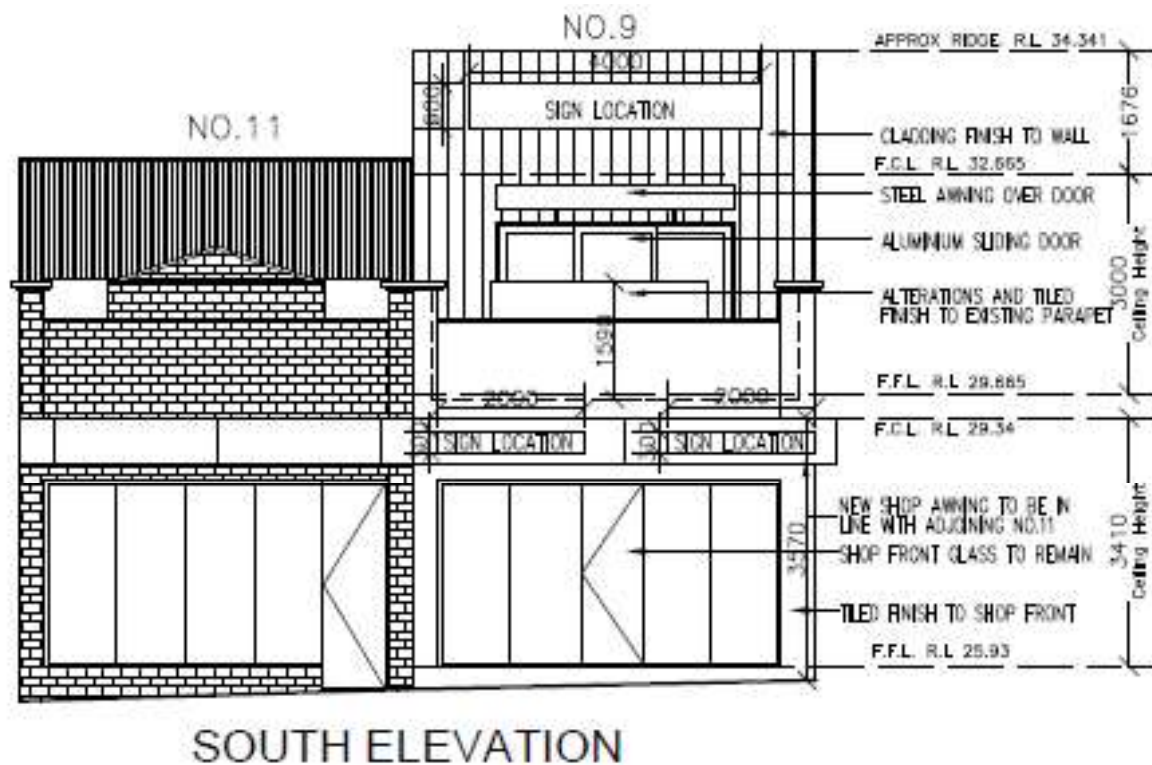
Proposed Development at 9 Marion Street, Bankstown (Inkon Plans)
